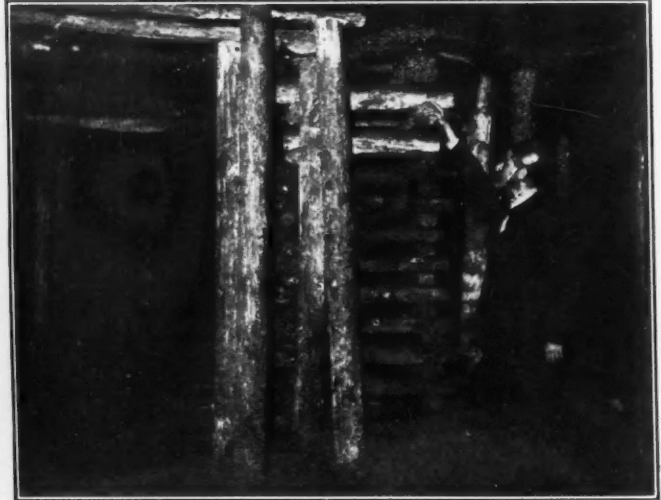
SHOWS TIMBER CRIB WEDGED TO ROOF AT INTERSECTION OF TWO ROADS
